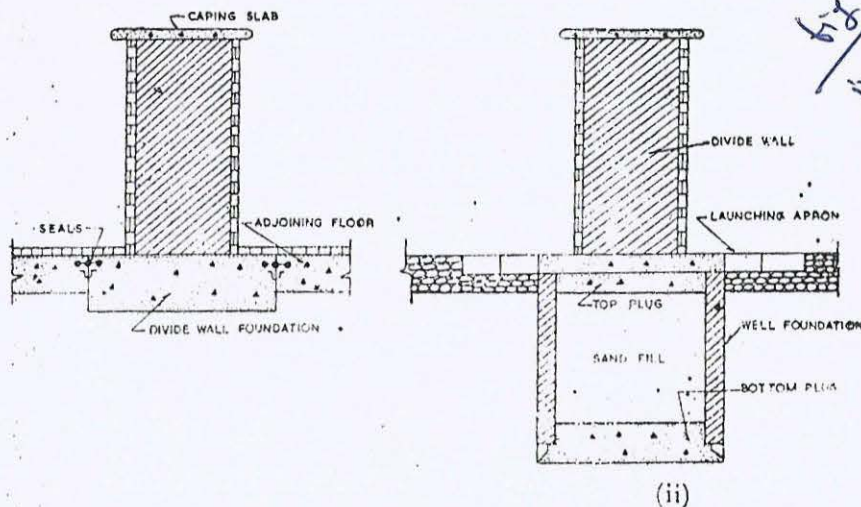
(i) Cross section of divide wall on pucca floor.
